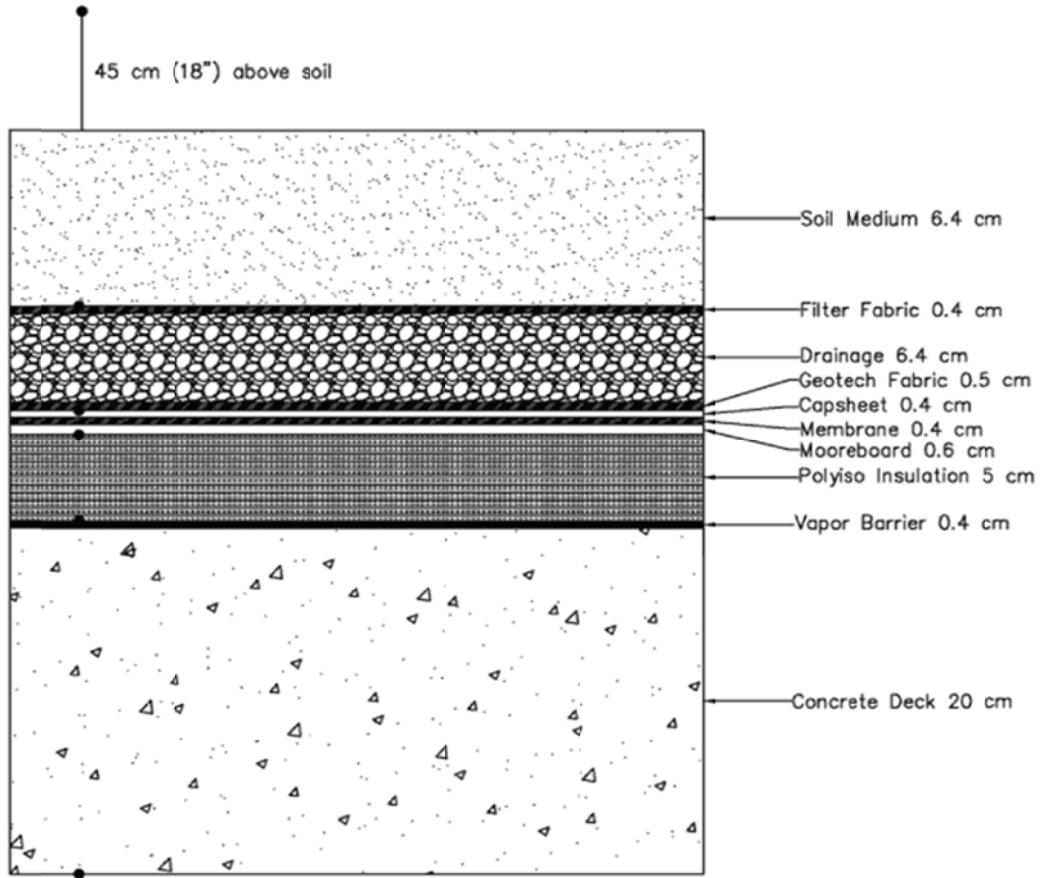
Cross section of the Hamerschlag Hall Green Roof
